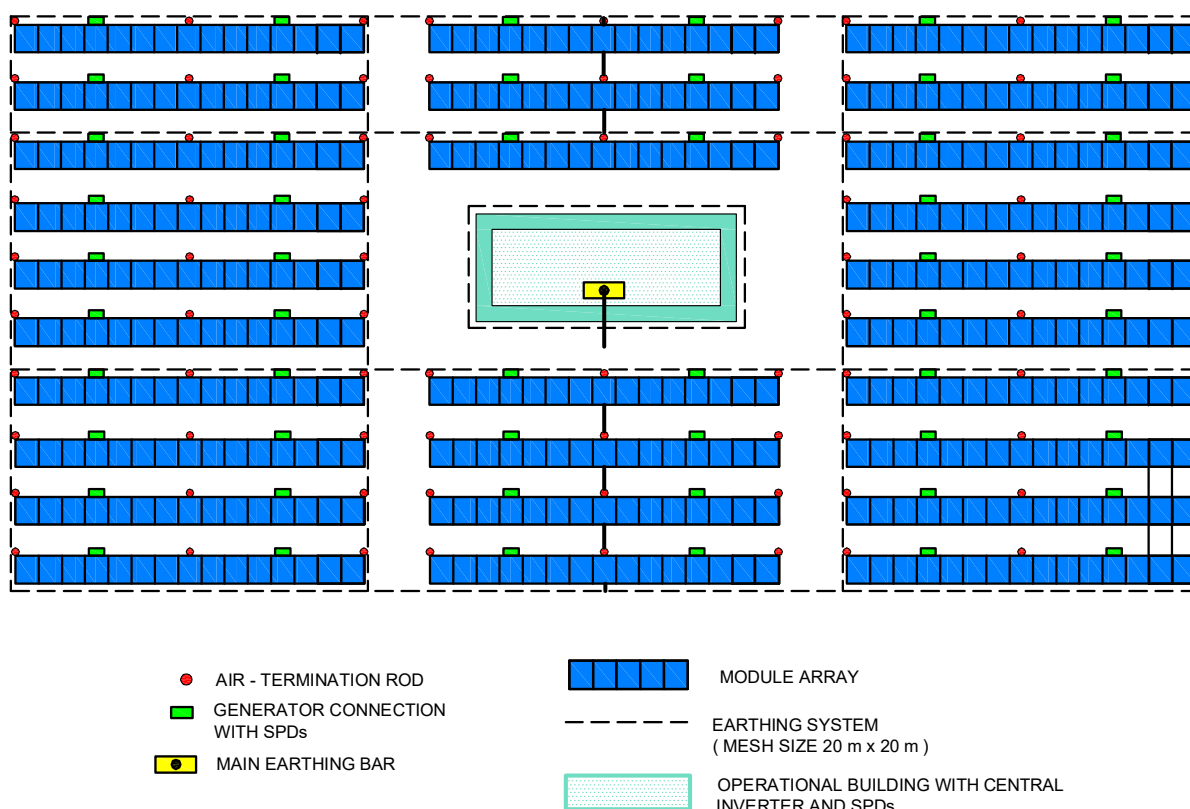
TYPICAL ARRANGEMENT OF EARTHING AND SURGE PROTECTION DEVICES IN SOLAR PV INSTALLATION
